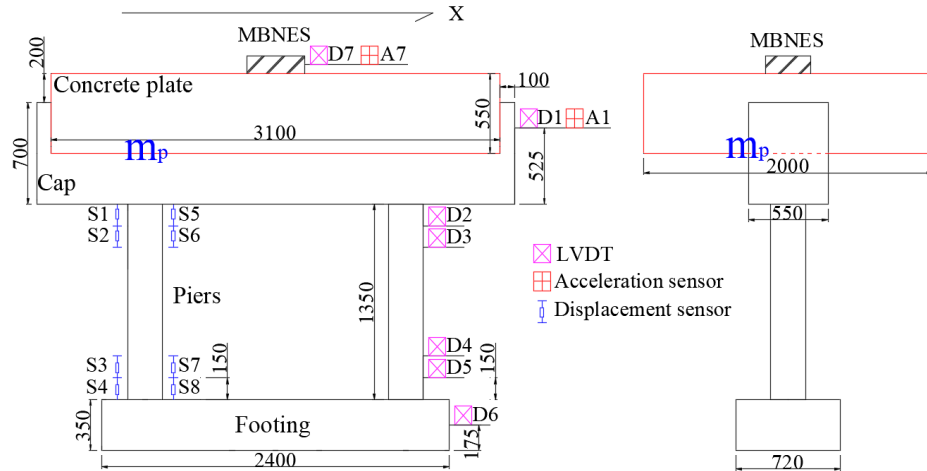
Design details and sensors arrangement of CIP double-column piers (unit: mm)
